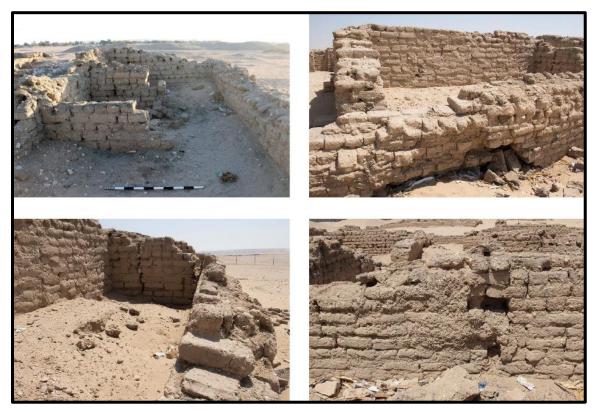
Crumbling, cracking and collapsing mudbrick is widespread in the exposed houses. Image courtesy of the Amarna Project.
